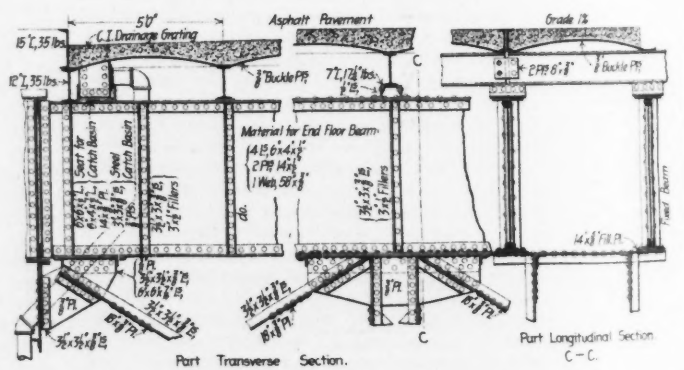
DETAILS OF FLOOR SYSTEM FOR 65-FT. SPAN.
